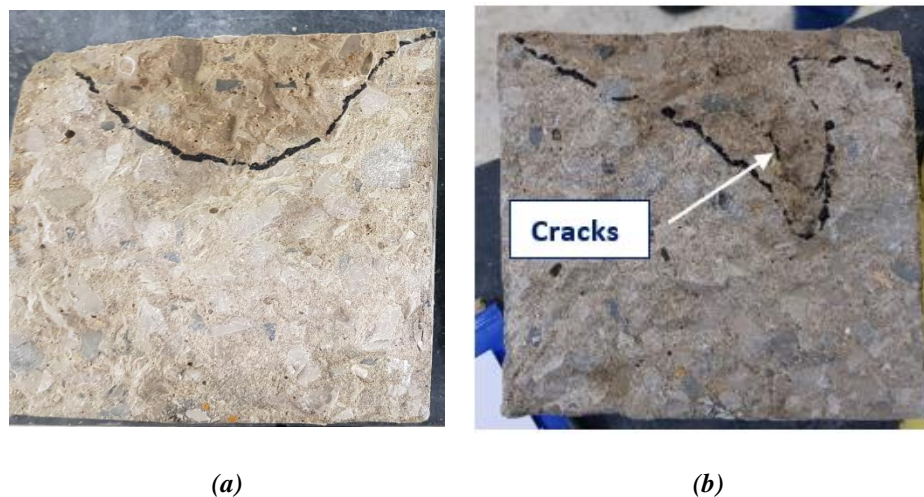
An example of the specimens used for the test of water depth under pressure for (a) an uncracked specimen and (b) a cracked specimen
